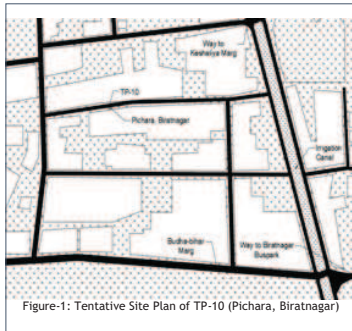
Tentative Site Plan of TP-10 (Pichara, Biratnagar)
